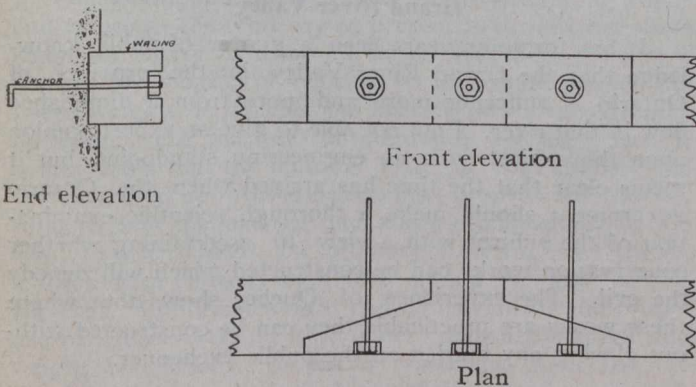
Suggested Method of Fastening Waling to a Wall
